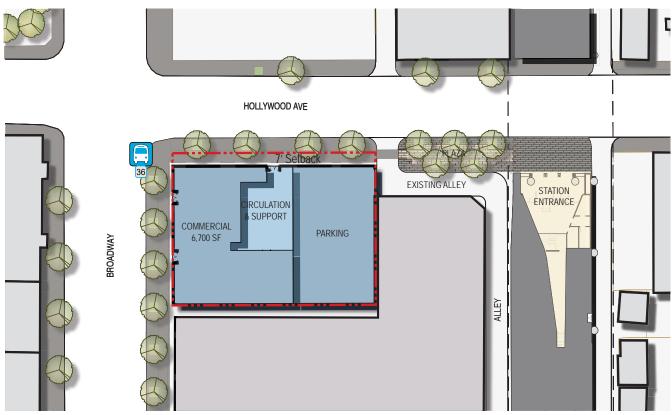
Hollywood Avenue and Broadway test concept site plan
